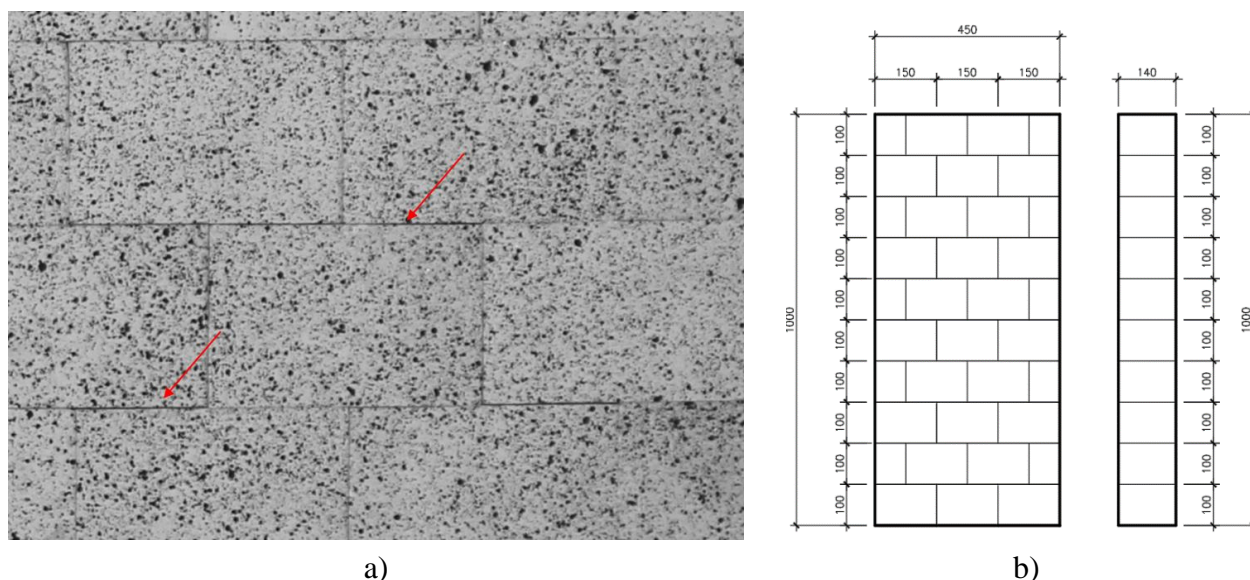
Specimen details: a) Bed joints imperfections in mortarless refractory masonry; b) Dimensions of the masonry wallet
